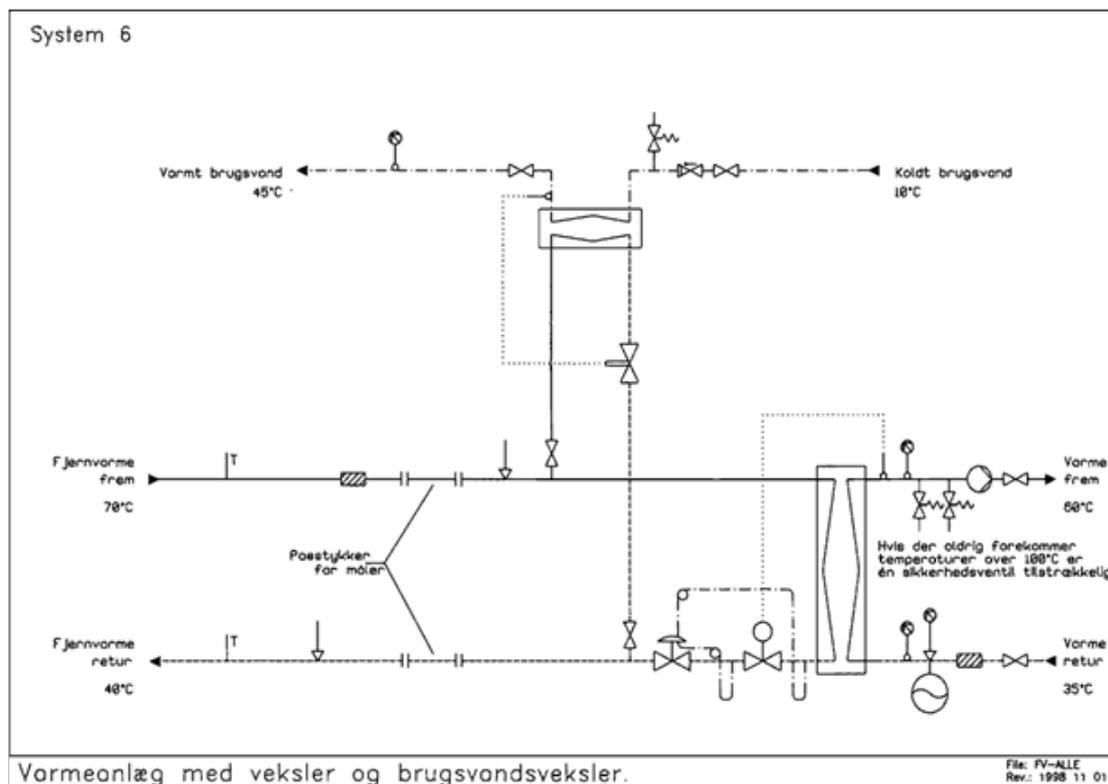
District heating substation with domestic hot water heater and heat exchanger for space heating in a one family house. A branch pipe is connecting the building with the district heating network.
